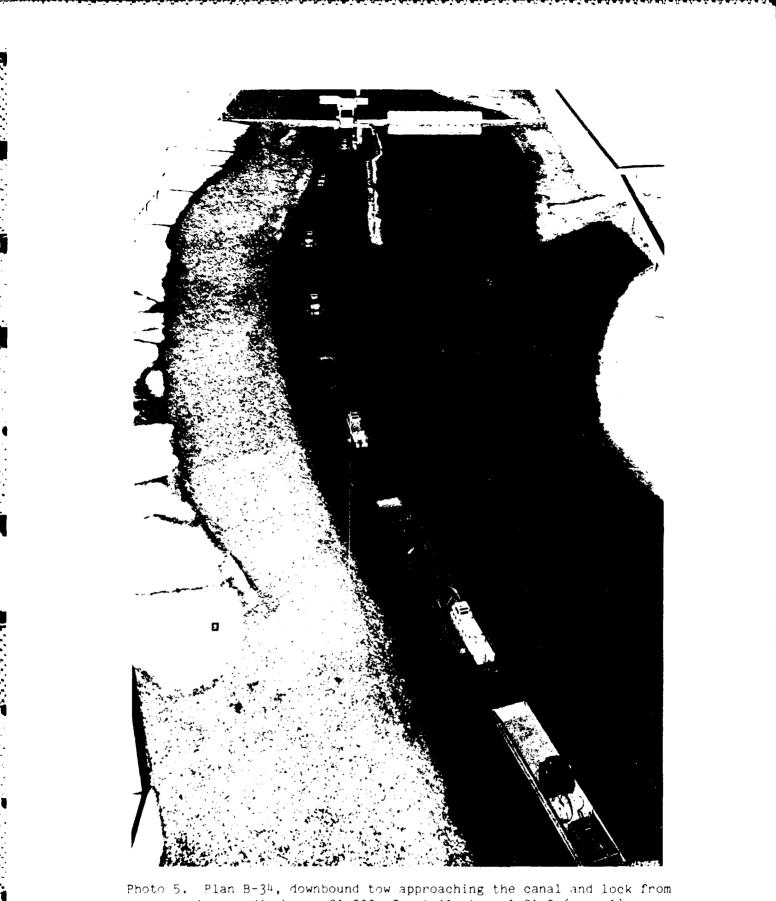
Plan B-34, downbound tow approaching the canal and lock from upstream; discharge 31,000 cfs, tailwater el 21.0 (normal)
